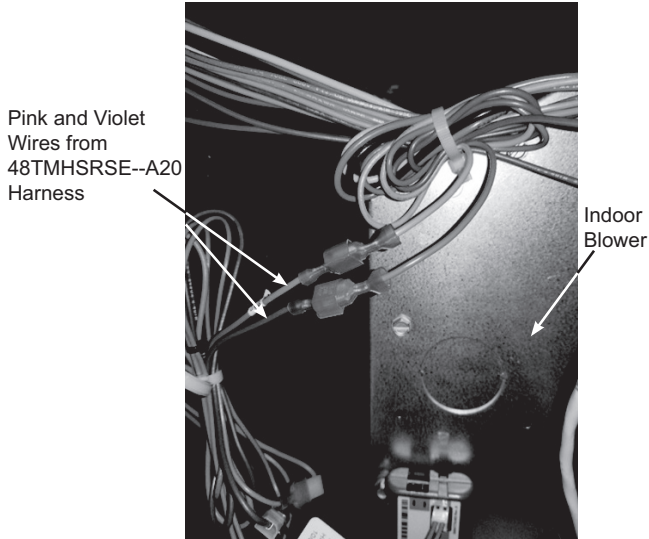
Connect Pink and Violet Wires in Indoor Blower Section
